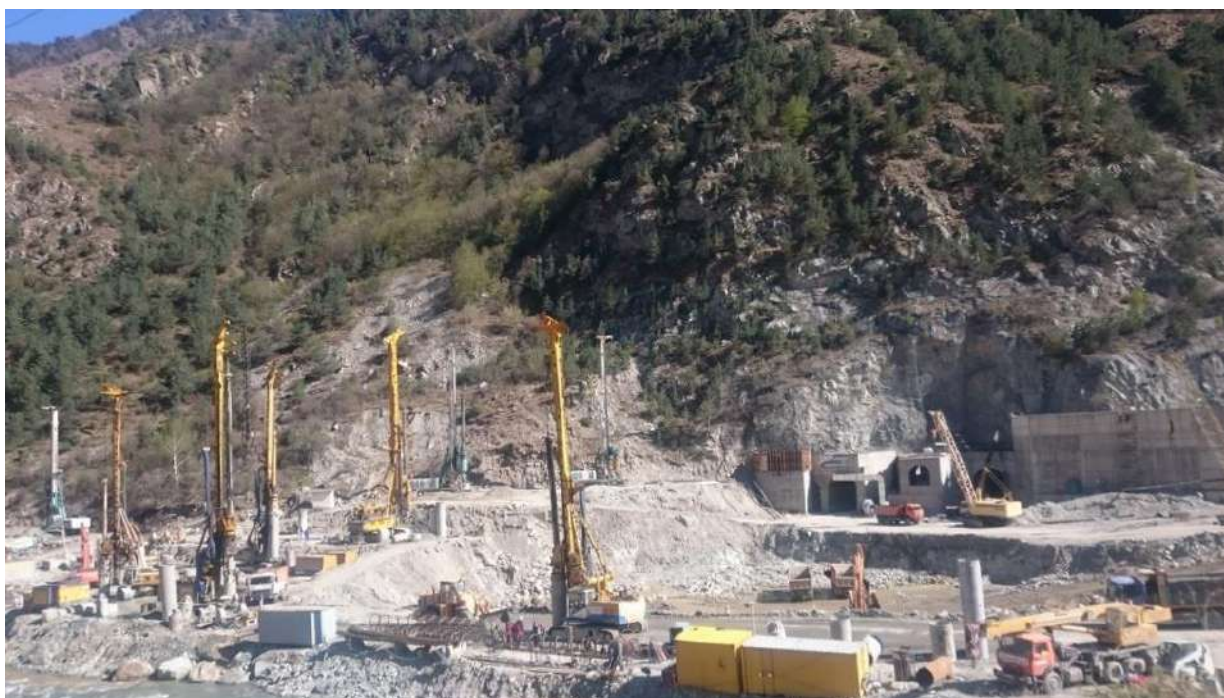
Installation of secant drilled piles to protect the excavation of the Zaramagskaya HPP-1 building <https://osetia.rushydro.ru/hpp/zaramagskaya-ges-1/>
